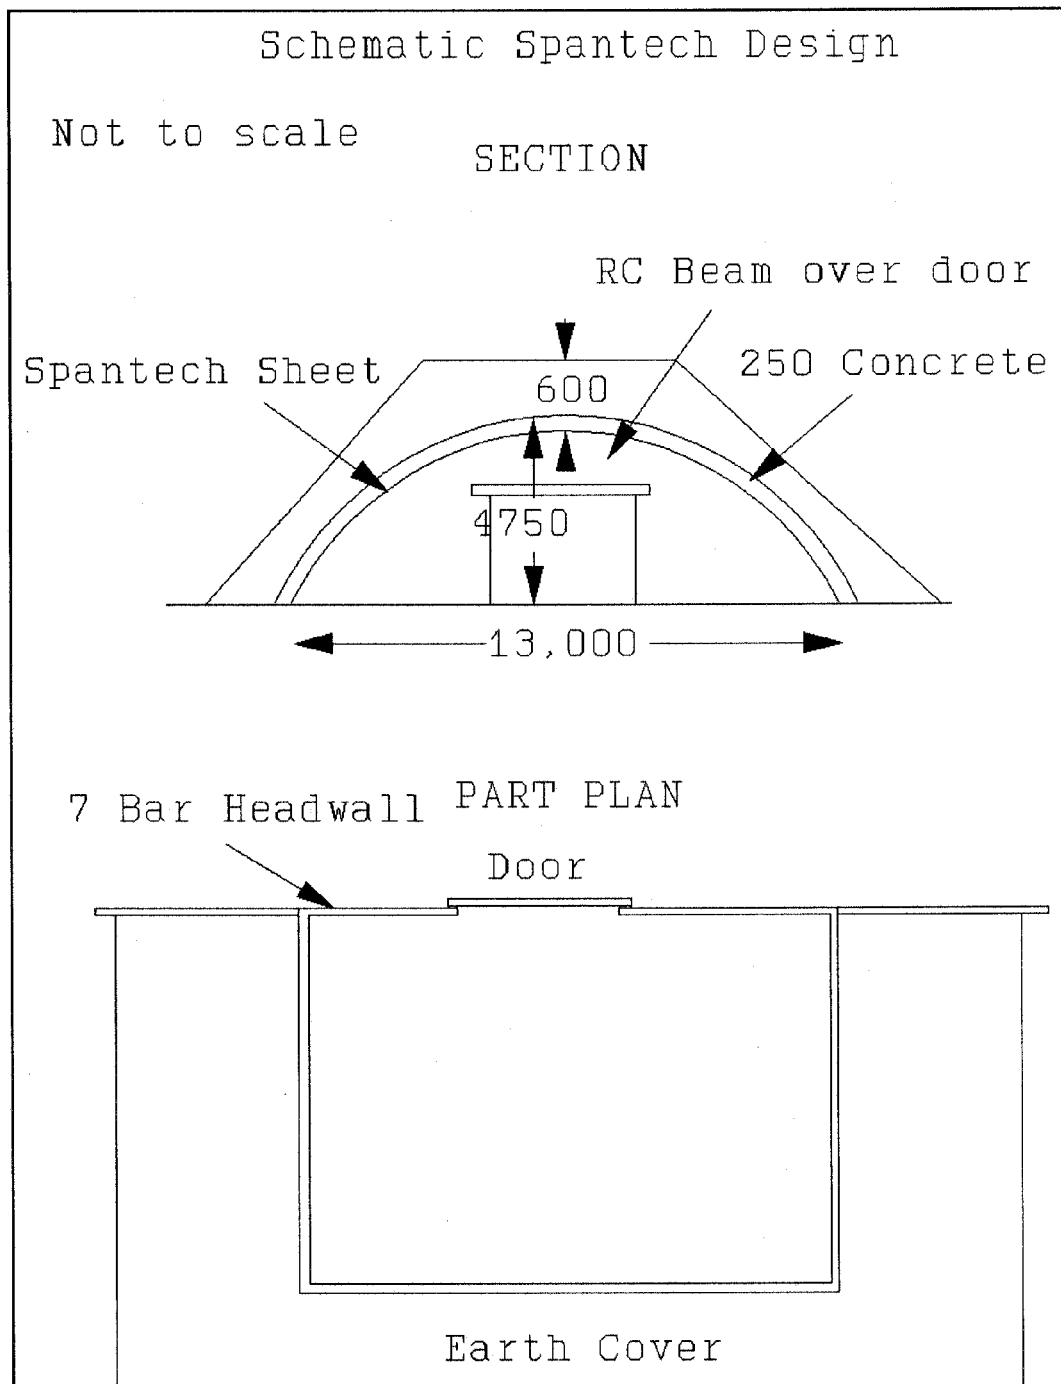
SPANTECH SCHEMATIC PLAN AND END ELEVATION
